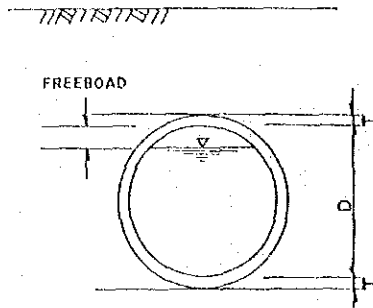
(1/3) STANDARD DRAWINGS OF PROPOSED STRUCTURES FOR FIRST STAGE PROJECT
